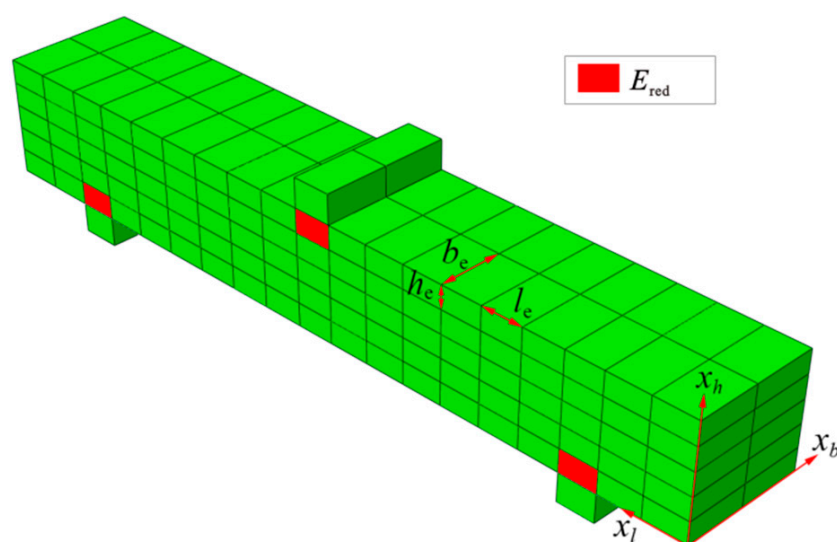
Finite element model of tested beam B-120. (Note: E_{red} is the concrete elements that used the constitutive model of the steel cushion block).
